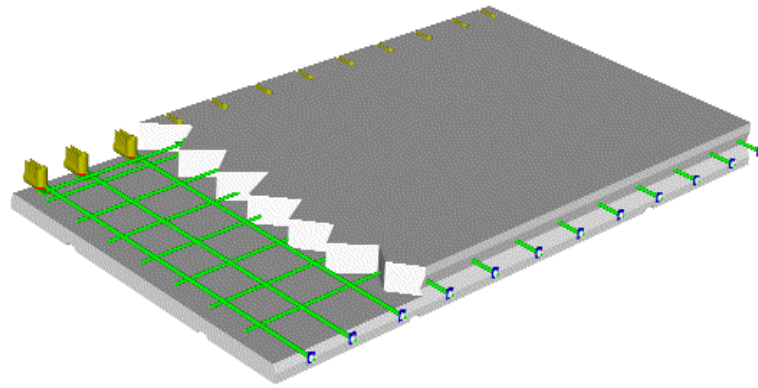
Kwik Slab Precast Slabs and Kwik Joint Steel Couplers
